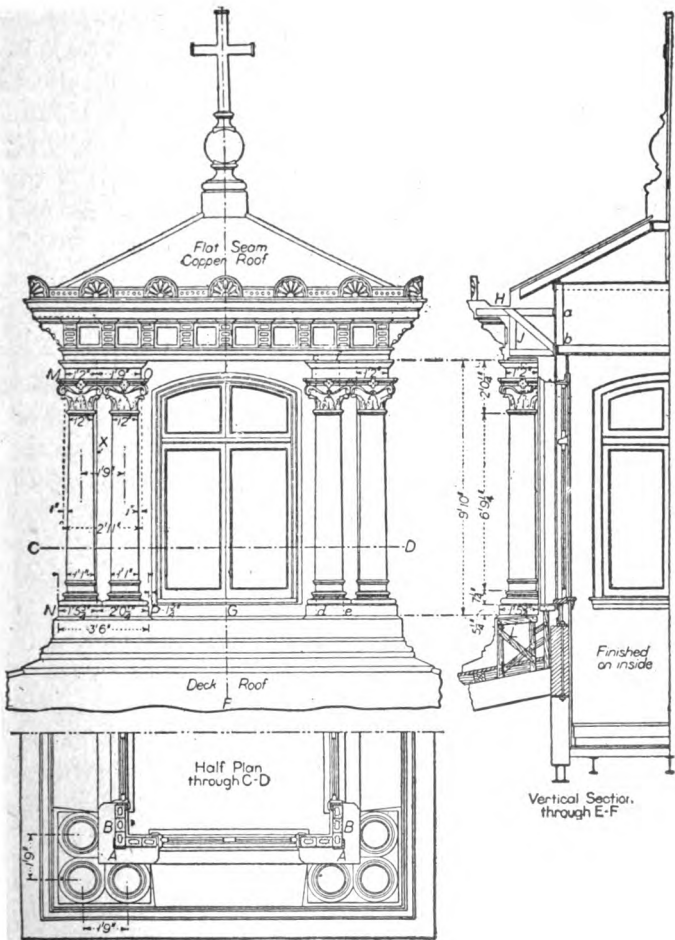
Front Elevation, Half Plan and Sectional View of Sheet Metal Cupola
